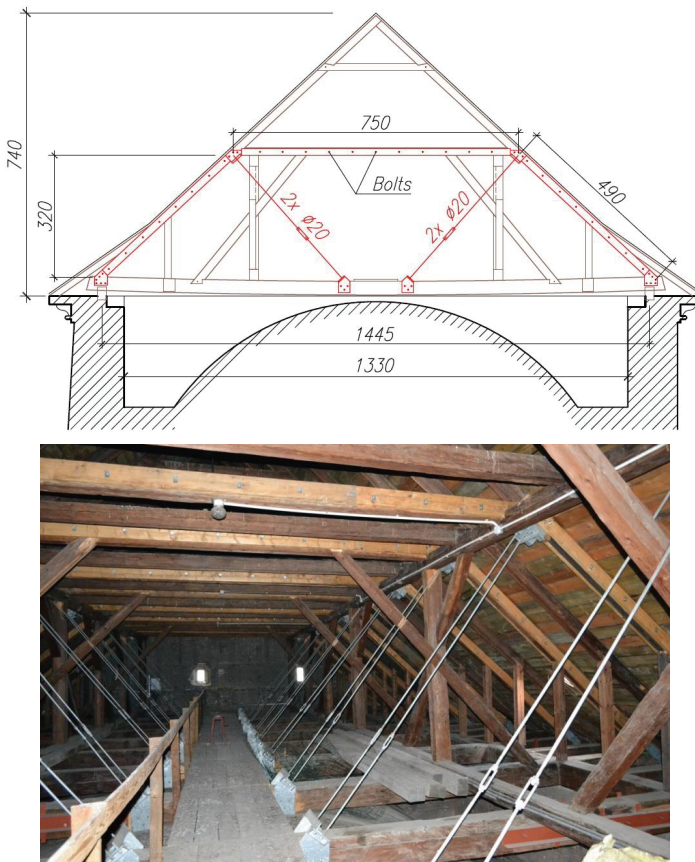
St Peter and Paul’s church. Tension-strut system lifting the roof footing beams.
